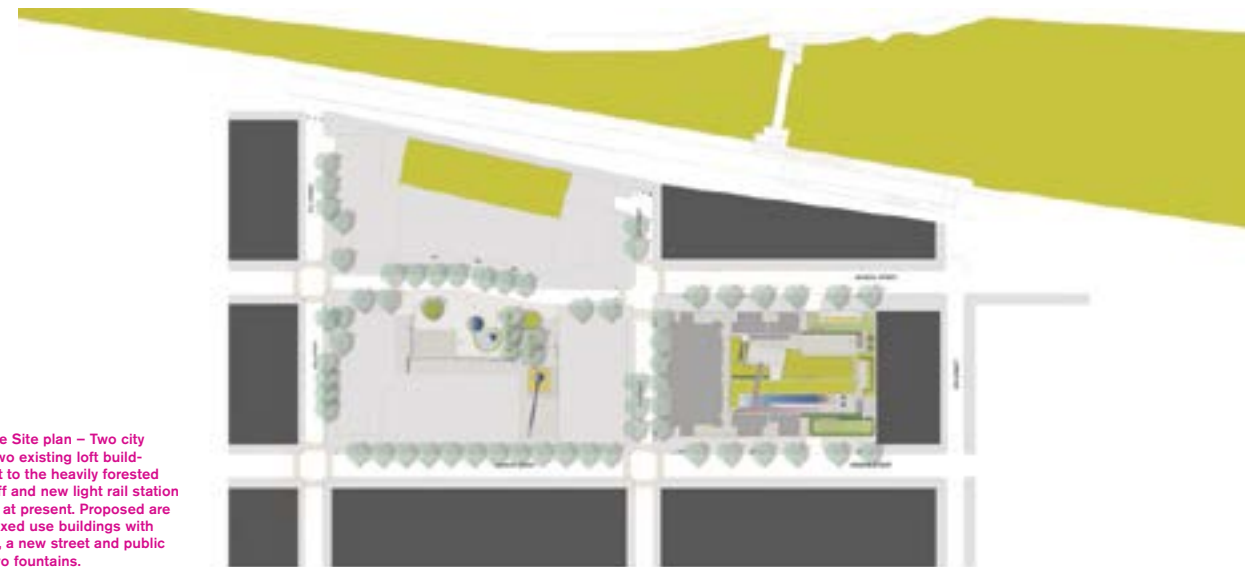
Monroe Site plan – Two city blocks and two existing loft buildings adjacent to the heavily forested Palisades cliff and new light rail station form the site at present. Proposed are three new mixed use buildings with roof gardens, a new street and public plaza with two fountains.
